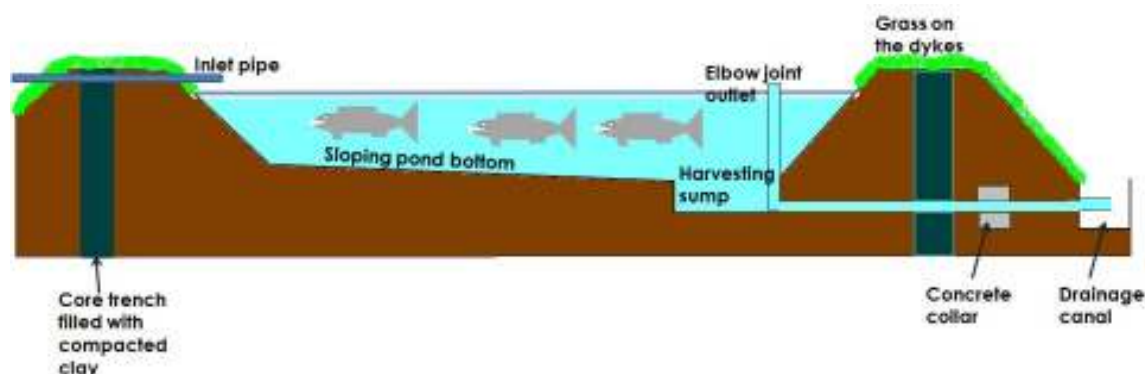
A cross section of a completed pond showing the position of various structures (Mbugua H. M.)
